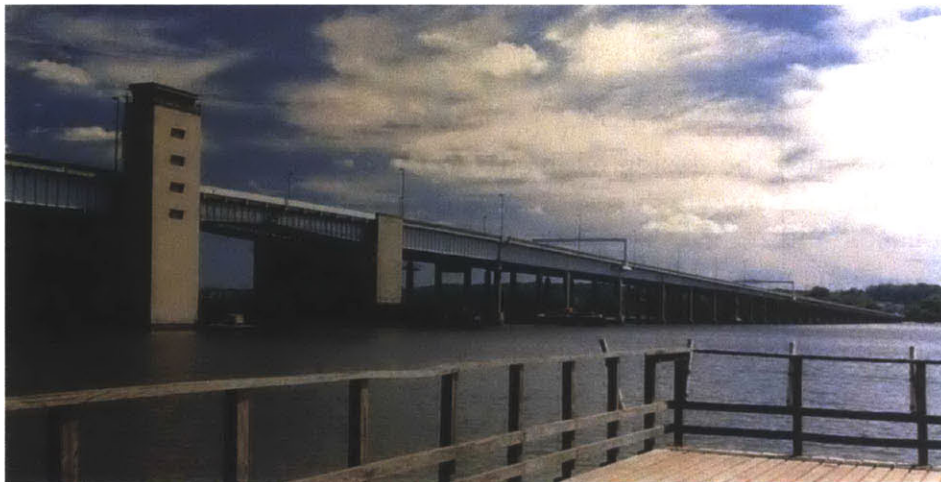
Existing Woodrow Wilson Bridge built in 1961; *Source: (Selection Panel Renderings Booklet 1998)
